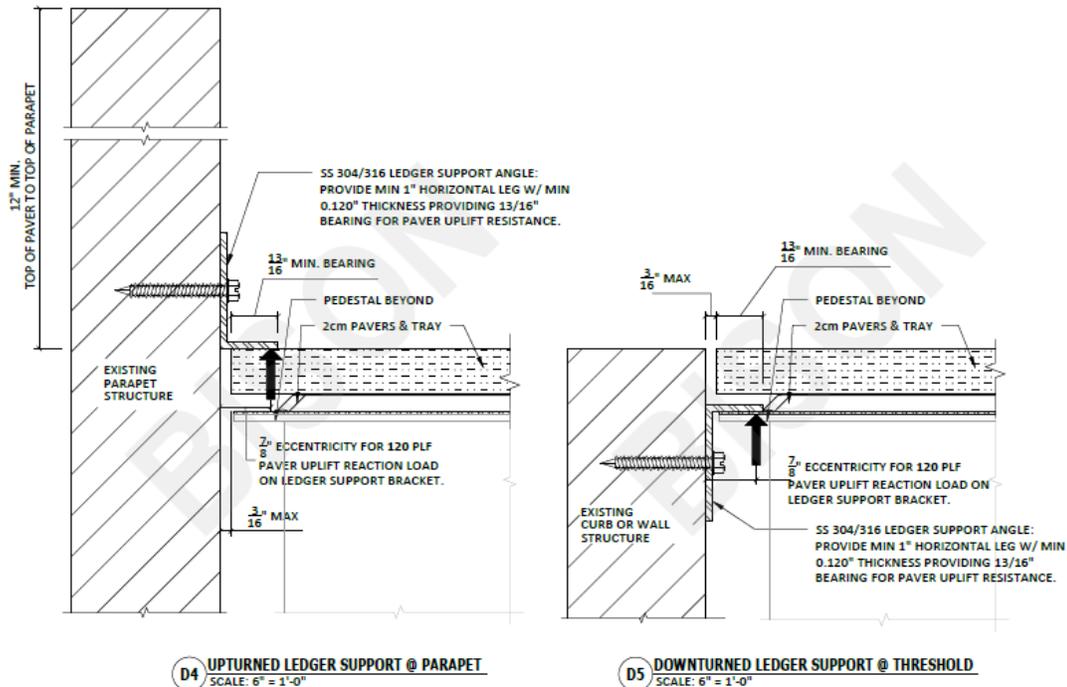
LEDGER SUPPORT DETAILS FOR BISON 2CM PAVERS AND TRAYS (SIMILAR FOR CONCRETE / STONE SLAB PAVERS)
